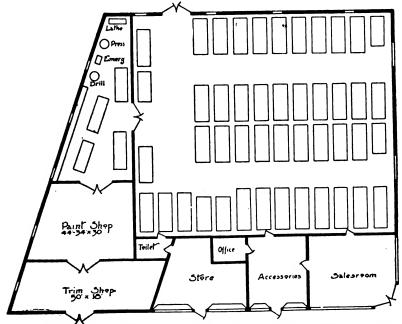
Rearrangement of Medium Garage Shown in Fig. 11, to Give More Regular Car Space
